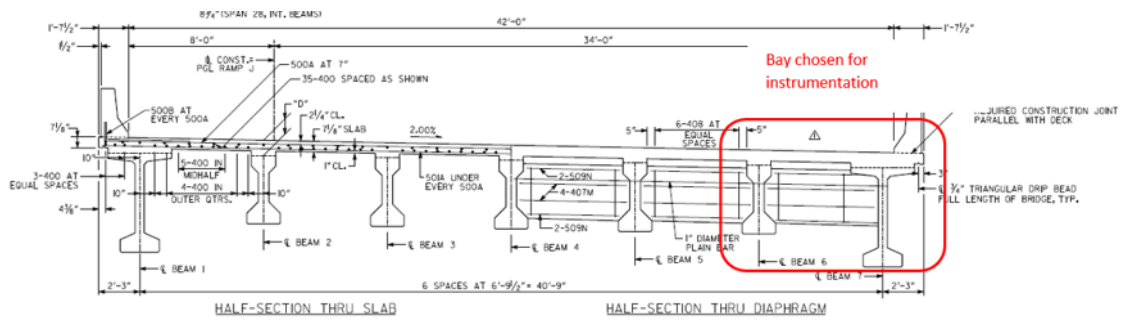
Engineering Drawing. Half-Section Span 27RT, Bridge 11B
